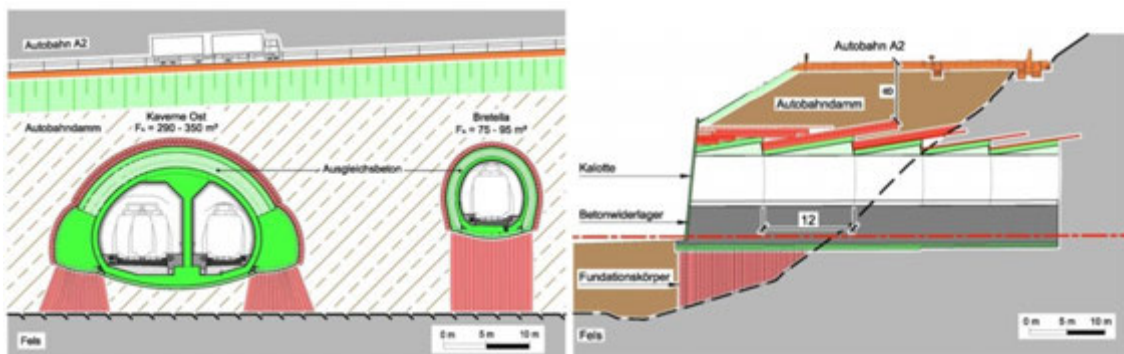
Schematic view of the excavation. Source: CIPM – Consorzio Ingegneri Piano di Magadino
